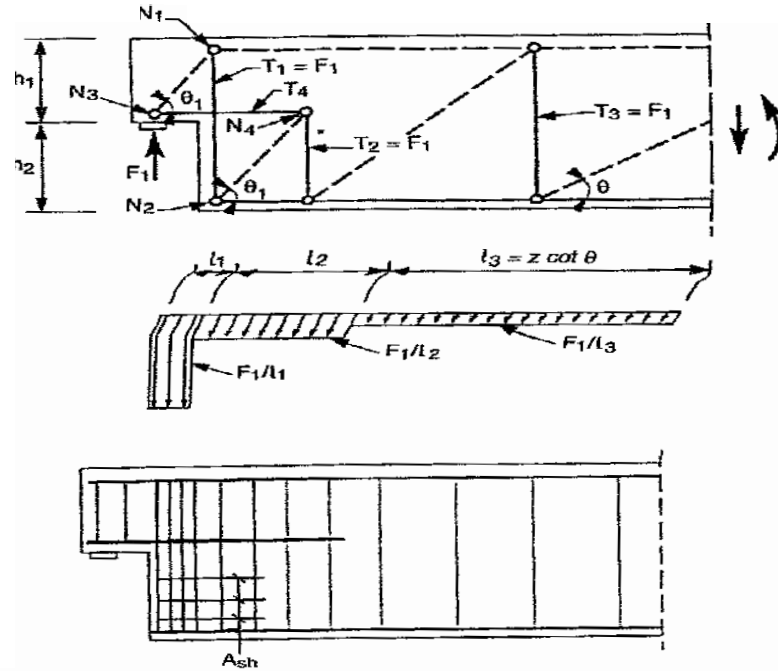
Model with horizontal reinforcement at the support and reinforcement style[2.5]
